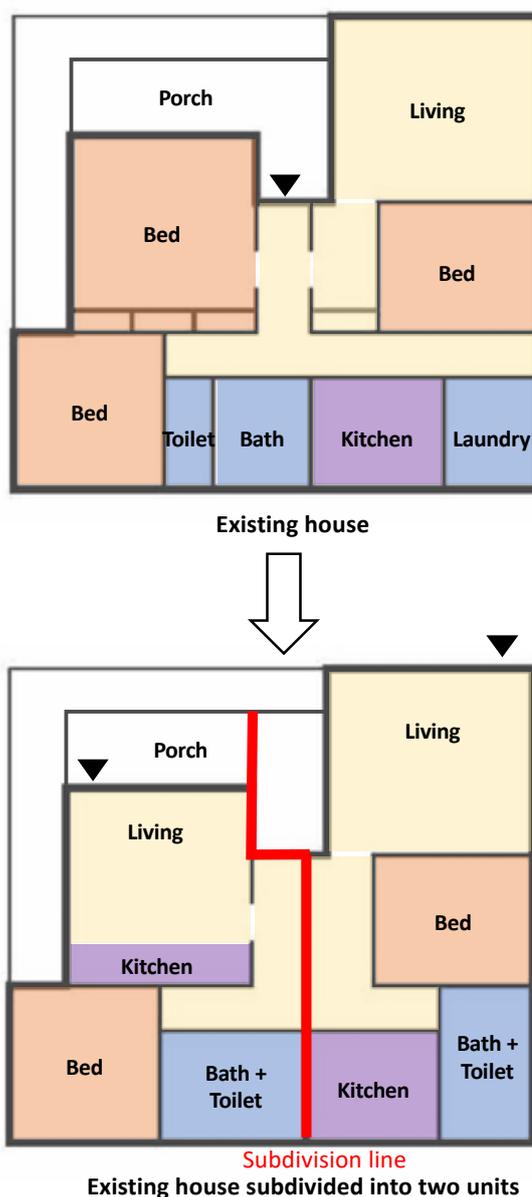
Example of a typical floorplan of an existing house subdivided into two units.
